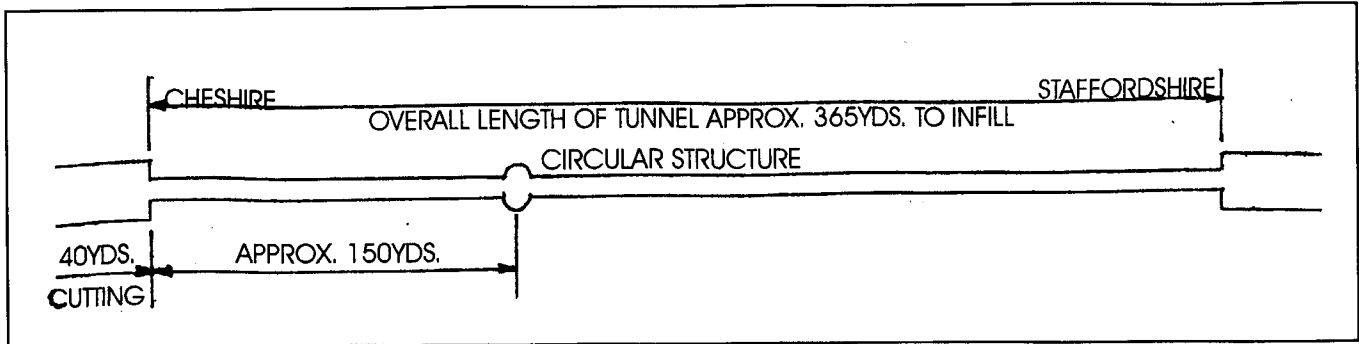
(top). Sketch plan of Mow Cop tunnel.
